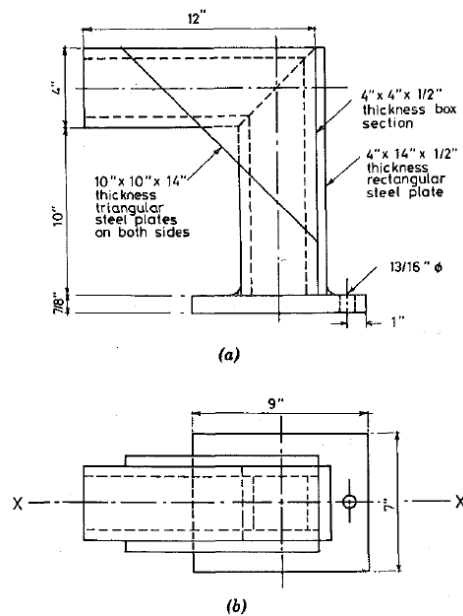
Specimen (a) Elevation and (b) Plan View (Thambiratnam and Paramasivam 1986)
